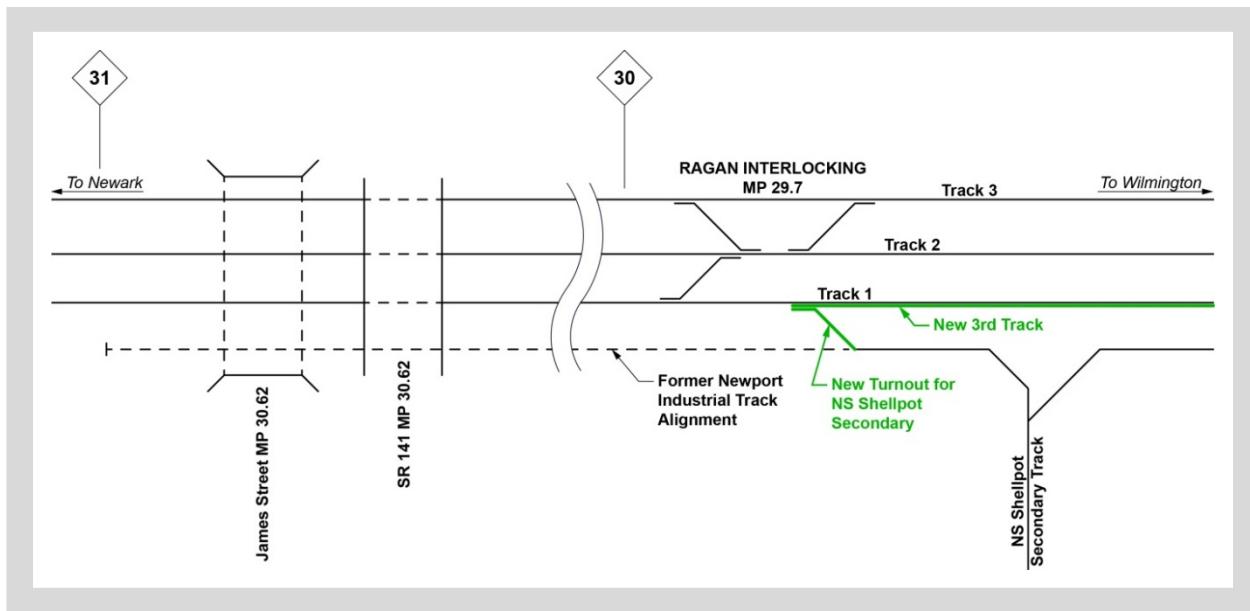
Proposed track layout for third track between Ragan and Wilmington.
